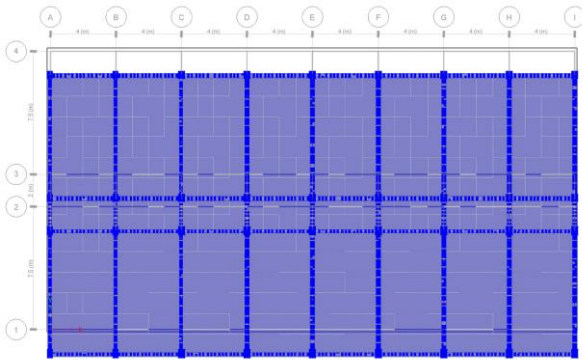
Finite element mode of the frame shear wall building using ETABS 18.
